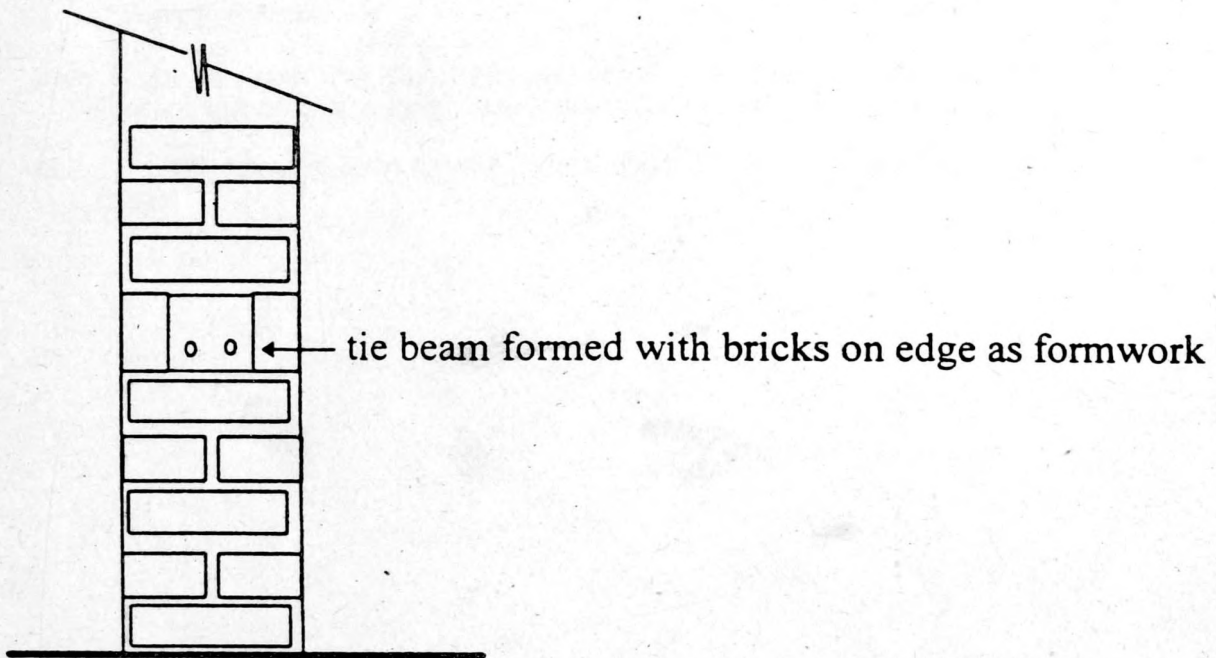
Construction of thin tie beams where bricks on edge have been used as formwork.
